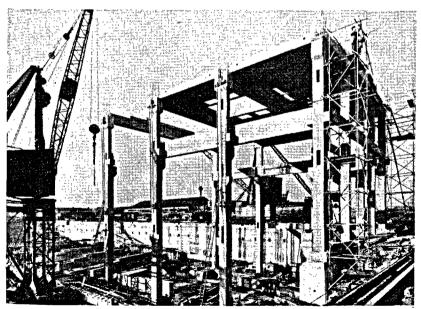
Precast structural concrete hangar in France having a span of 98 ft. 692
